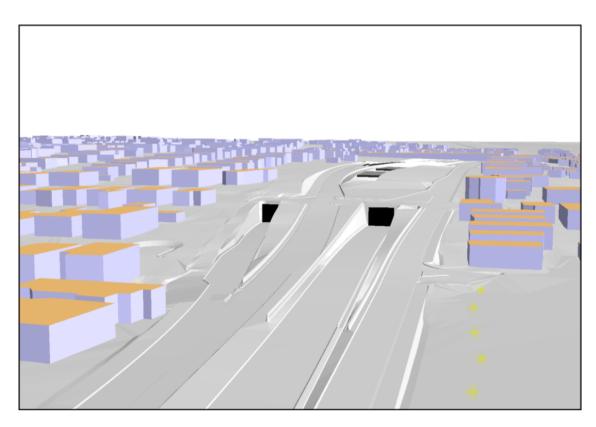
Reconfigured Wattle Street interchange (oblique elevation, facing south)
